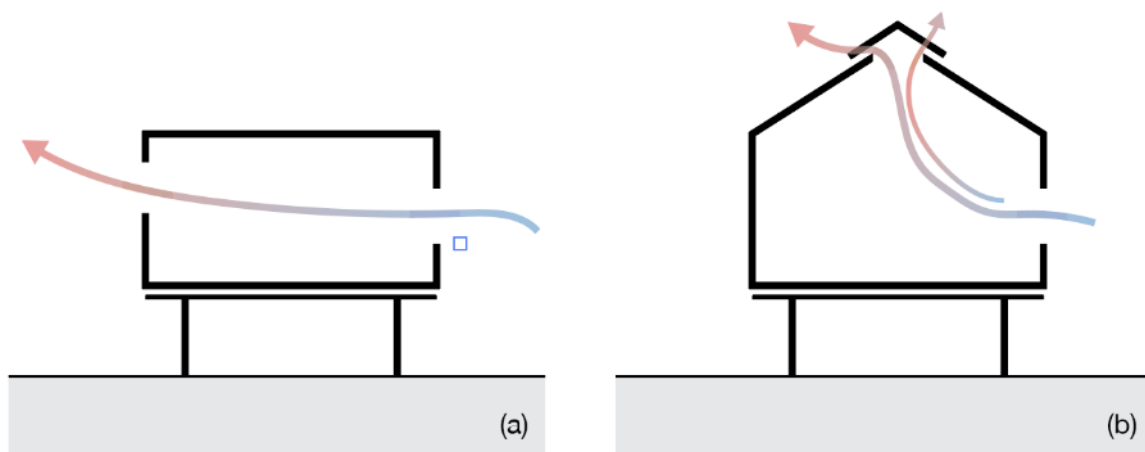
Cross ventilation in buildings with window openings (a) and roof vents (b).
